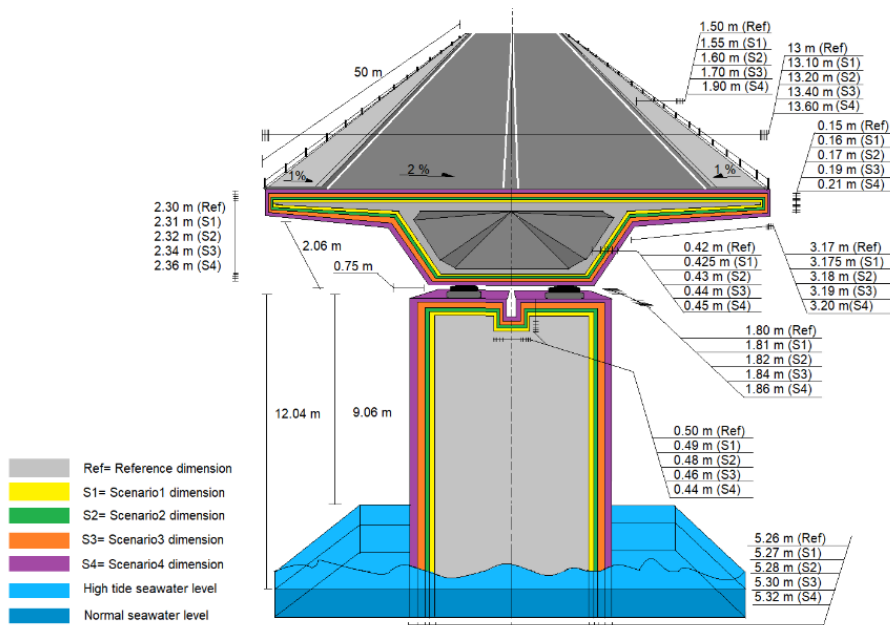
1. *The cross-section dimension of the coastal and concrete Arosa bridge.
